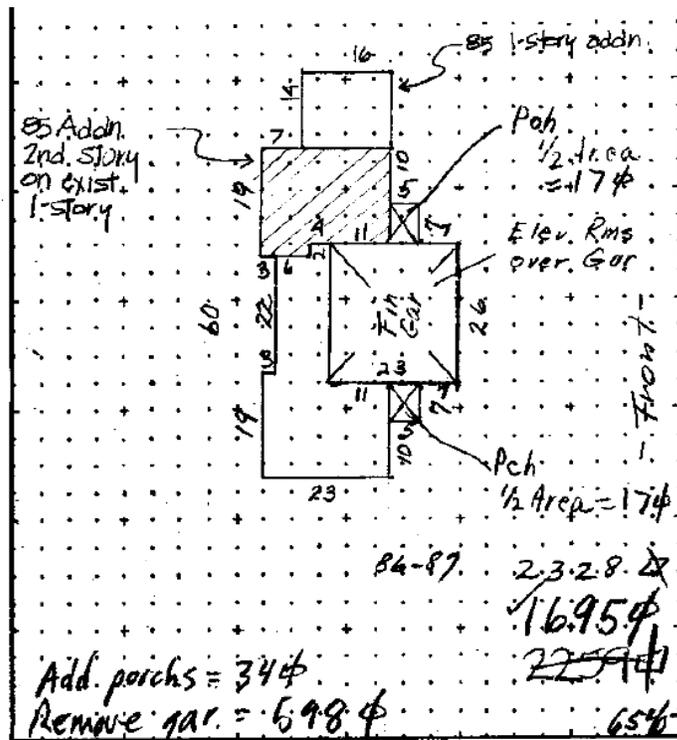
1986 site plan of the subject building. South is up. Source: City of Berkeley Planning and Development Department.
